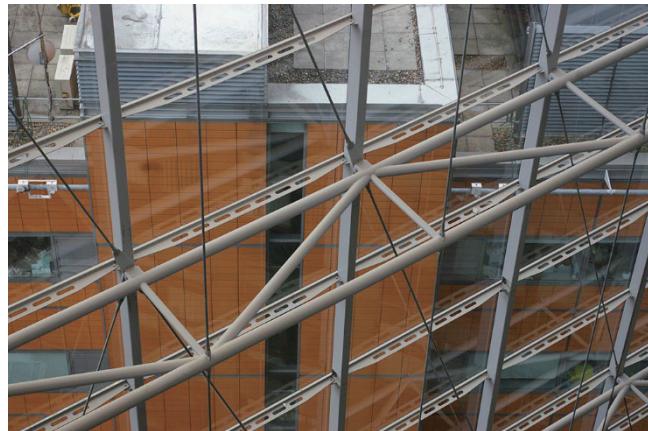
STH Glass Curtain Wall (2015 年撮影)
